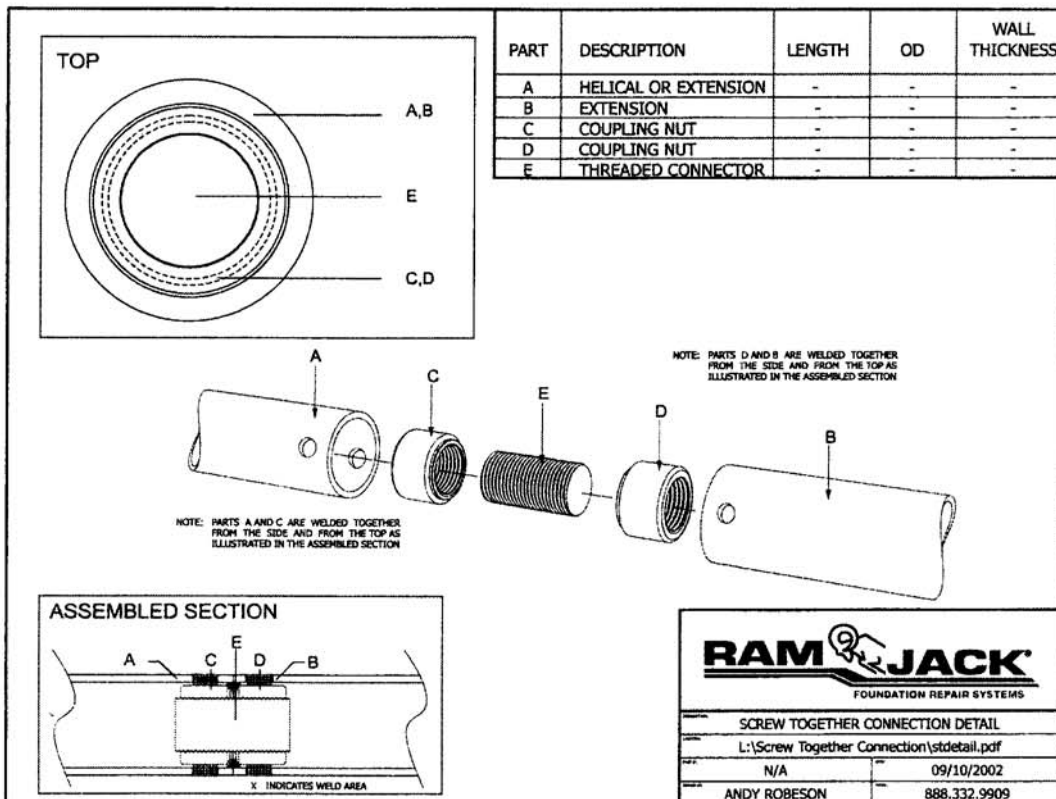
HELICAL ANCHOR AND EXTENSION SCREW-TOGETHER CONNECTION DETAIL
